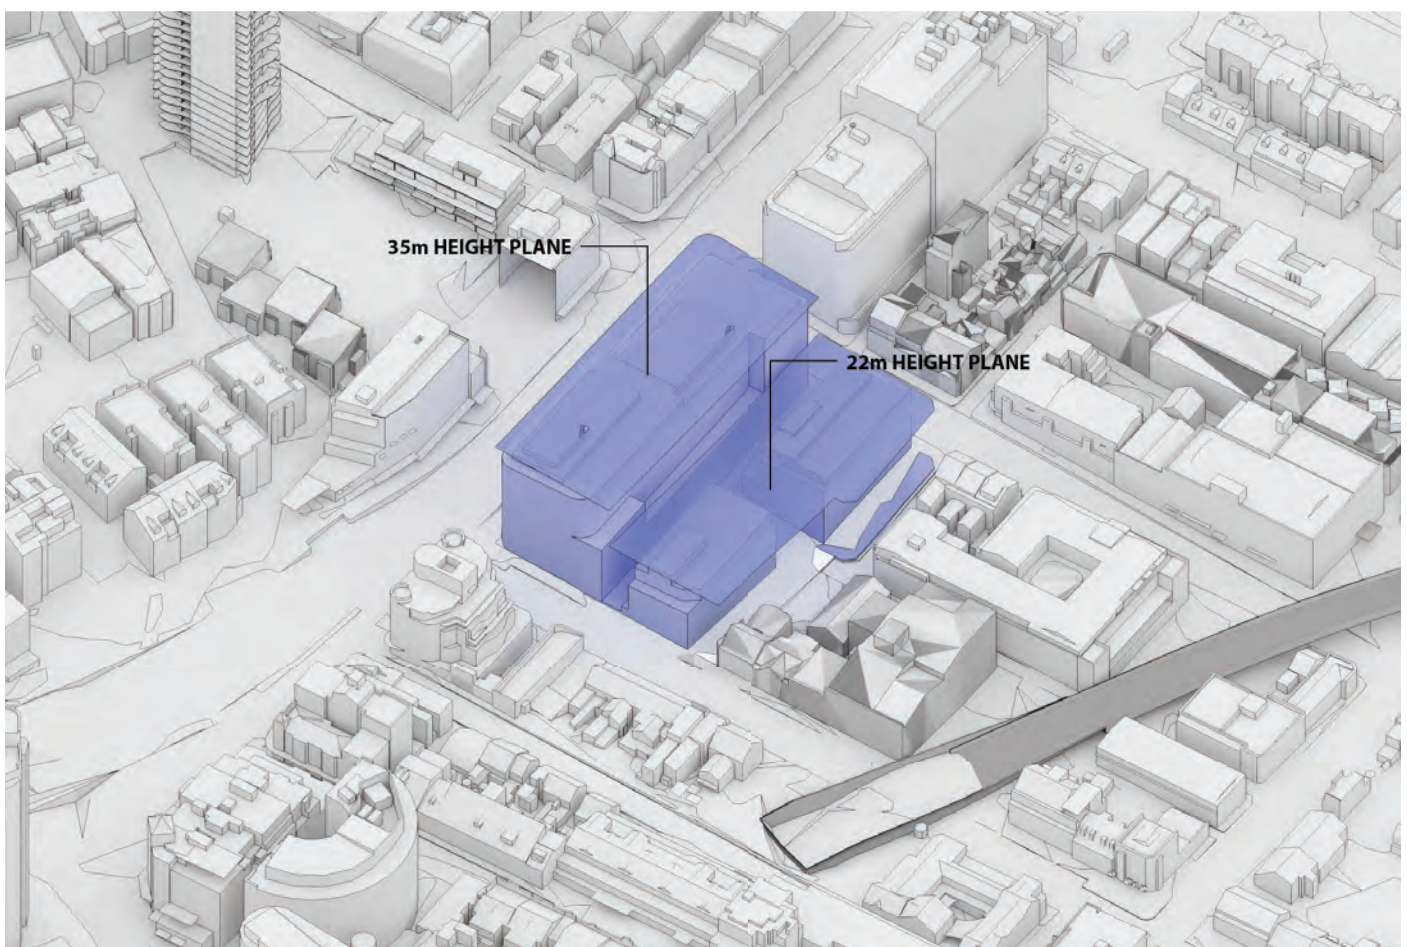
Proposed building mass shown with permitted height plane by FJC Studio Architects.
